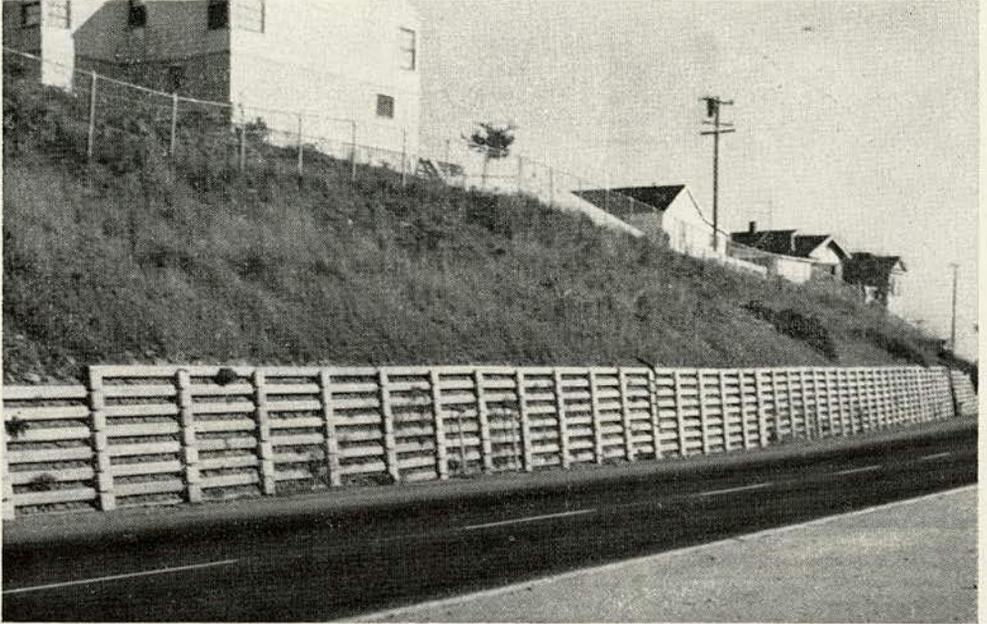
Restraining structure; concrete crib wall installed during construction to prevent land movement which might jeopardize dwellings located above top of cut slope at Arcata, Calif. Note gravel back-fill. (Photograph by T. W. Smith, courtesy of California Division of Highways)
